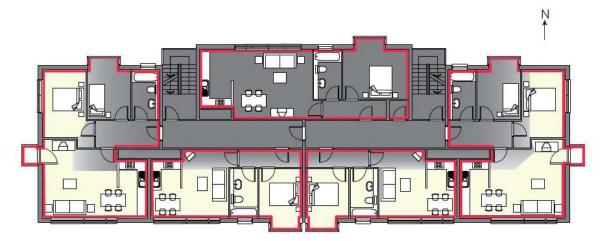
Careful layout design means that four out of the five flats shown have a south-facing living room
